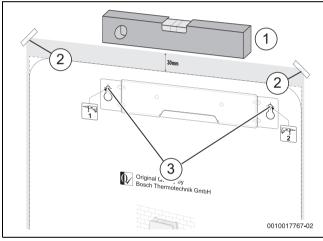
Drilling template (wall mounting bracket at top), on finished walls
